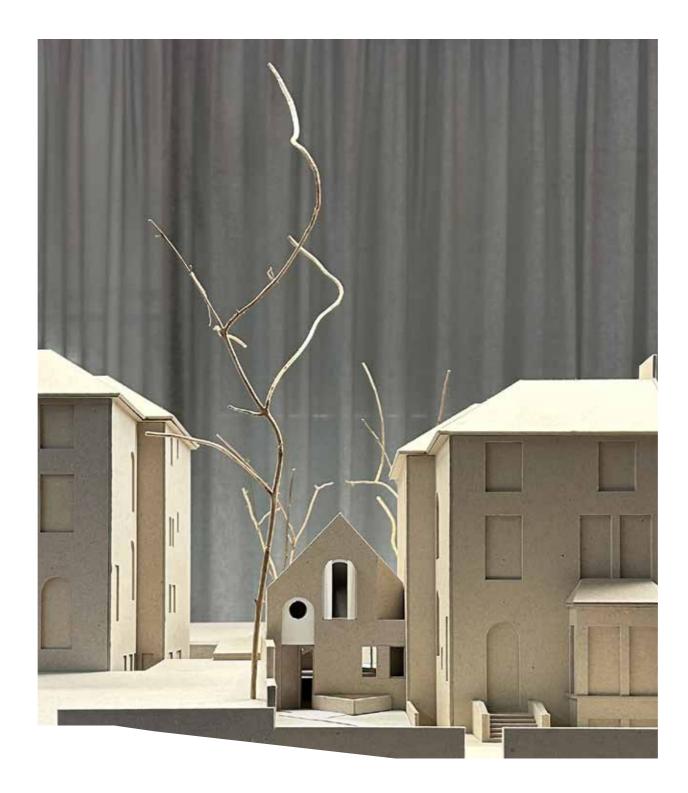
01. Card model illustrating the view of the South-facing facade taken from Lyndhurst Road demonstrating the window proportions relative to no.9 and 10 adjacent properties.
